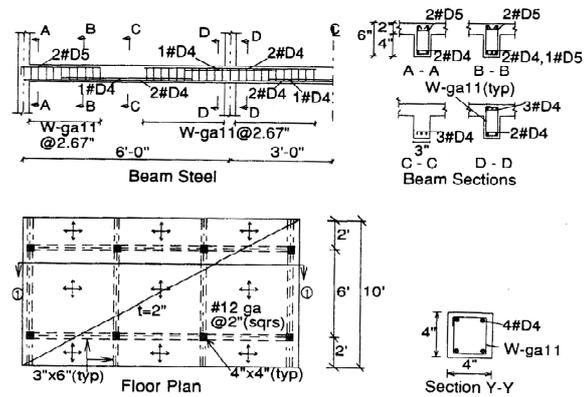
Dimensions and reinforcement arrangement of three storey frame model (Bracci *et al*, 1995).
